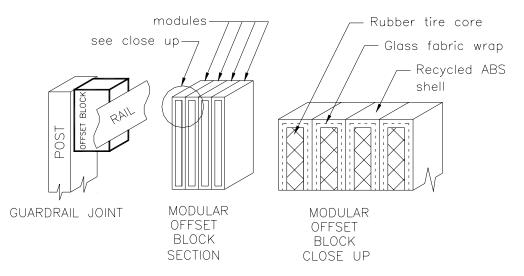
Typical Guardrail Joint Configuration and Modular Offset Block
